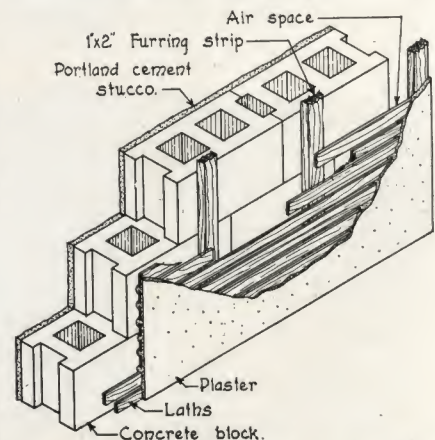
All masonry walls for residences should have the plaster furred out to insure against condensation, two-piece and cinder concrete block possibly excepted.
